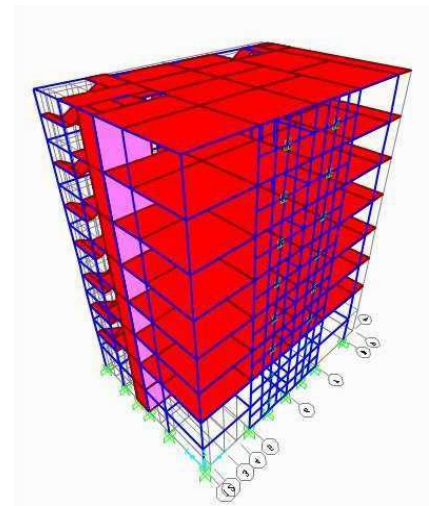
Model with dampers at interiors and with shear wall (SAP2000)
